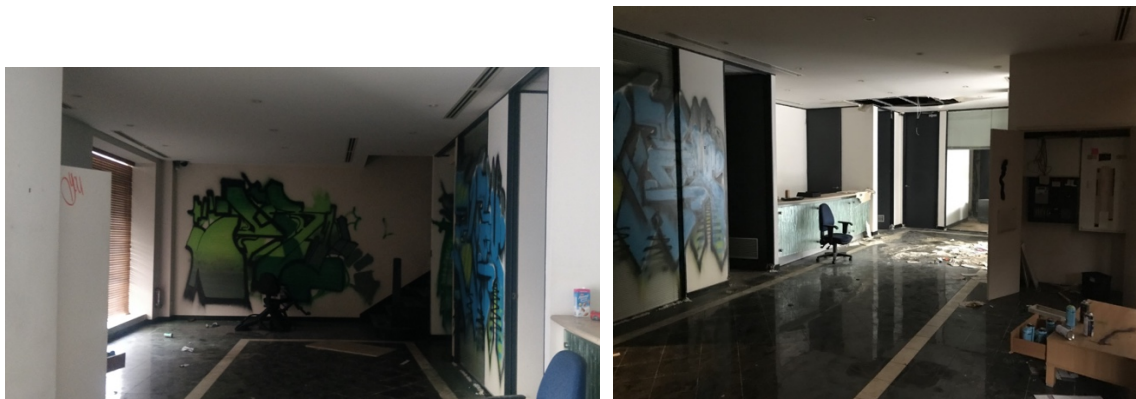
Views of the ground floor lobby area. Source: Trethowan Architecture, 2021.
